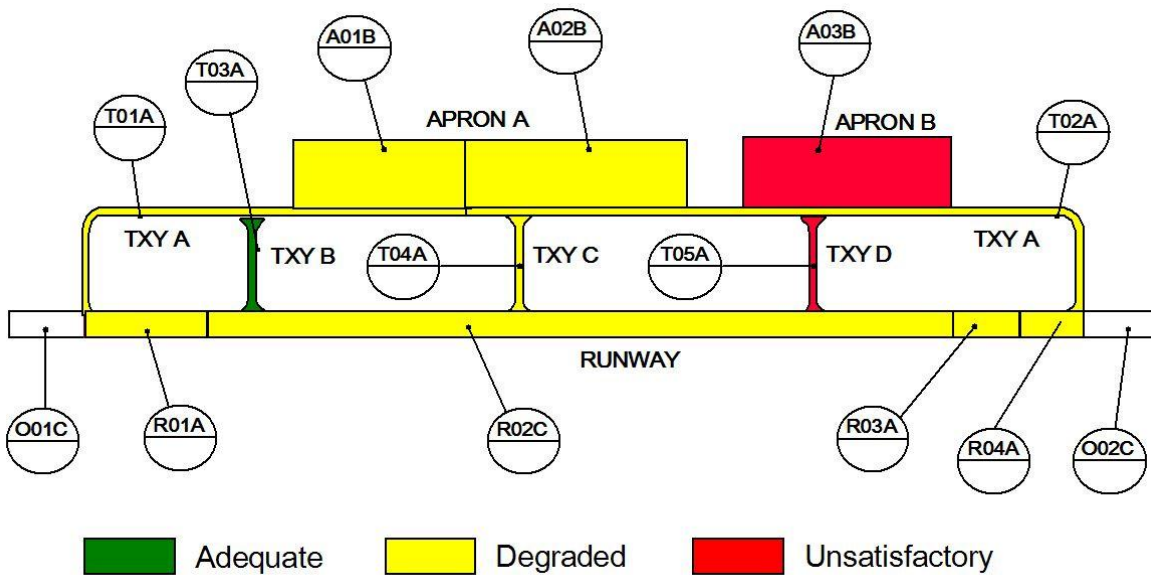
Sample Airfield Layout Plan Rated by Branch.
